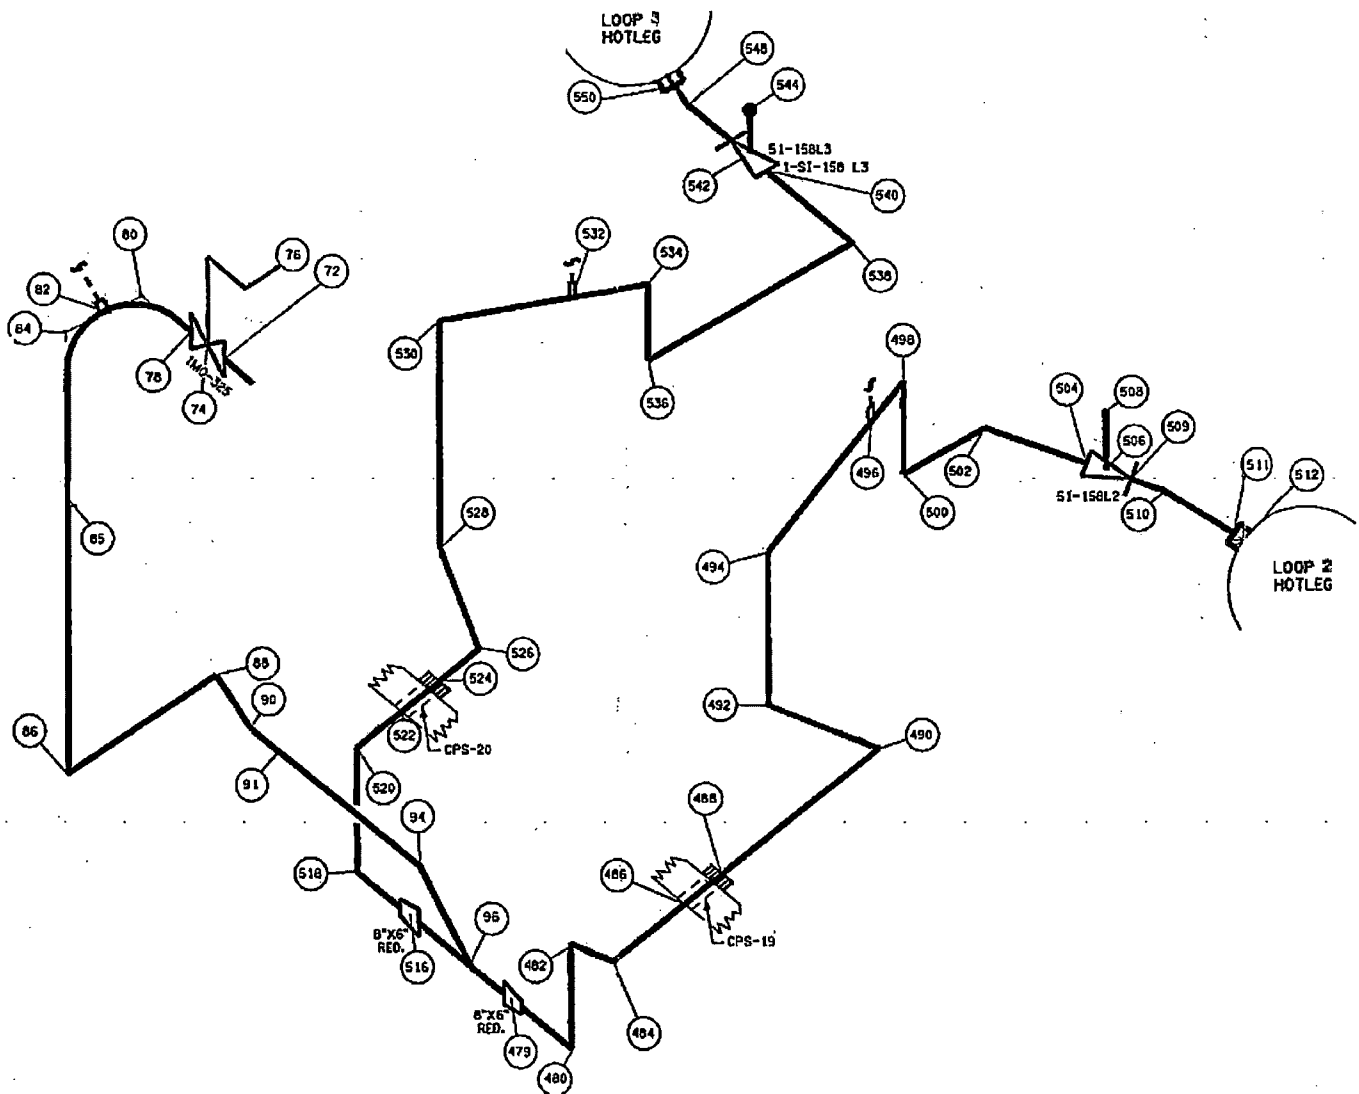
D.C. Cook Unit 1 Hot Leg SI Line Layout Showing Weld Locations with Node Points – Loops 2 and 3
